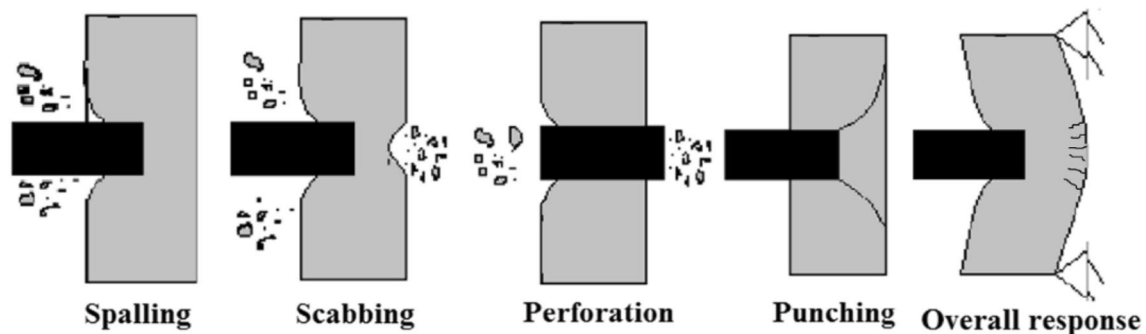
Typical failure modes of concrete structures under different impact loads [5, 6]
